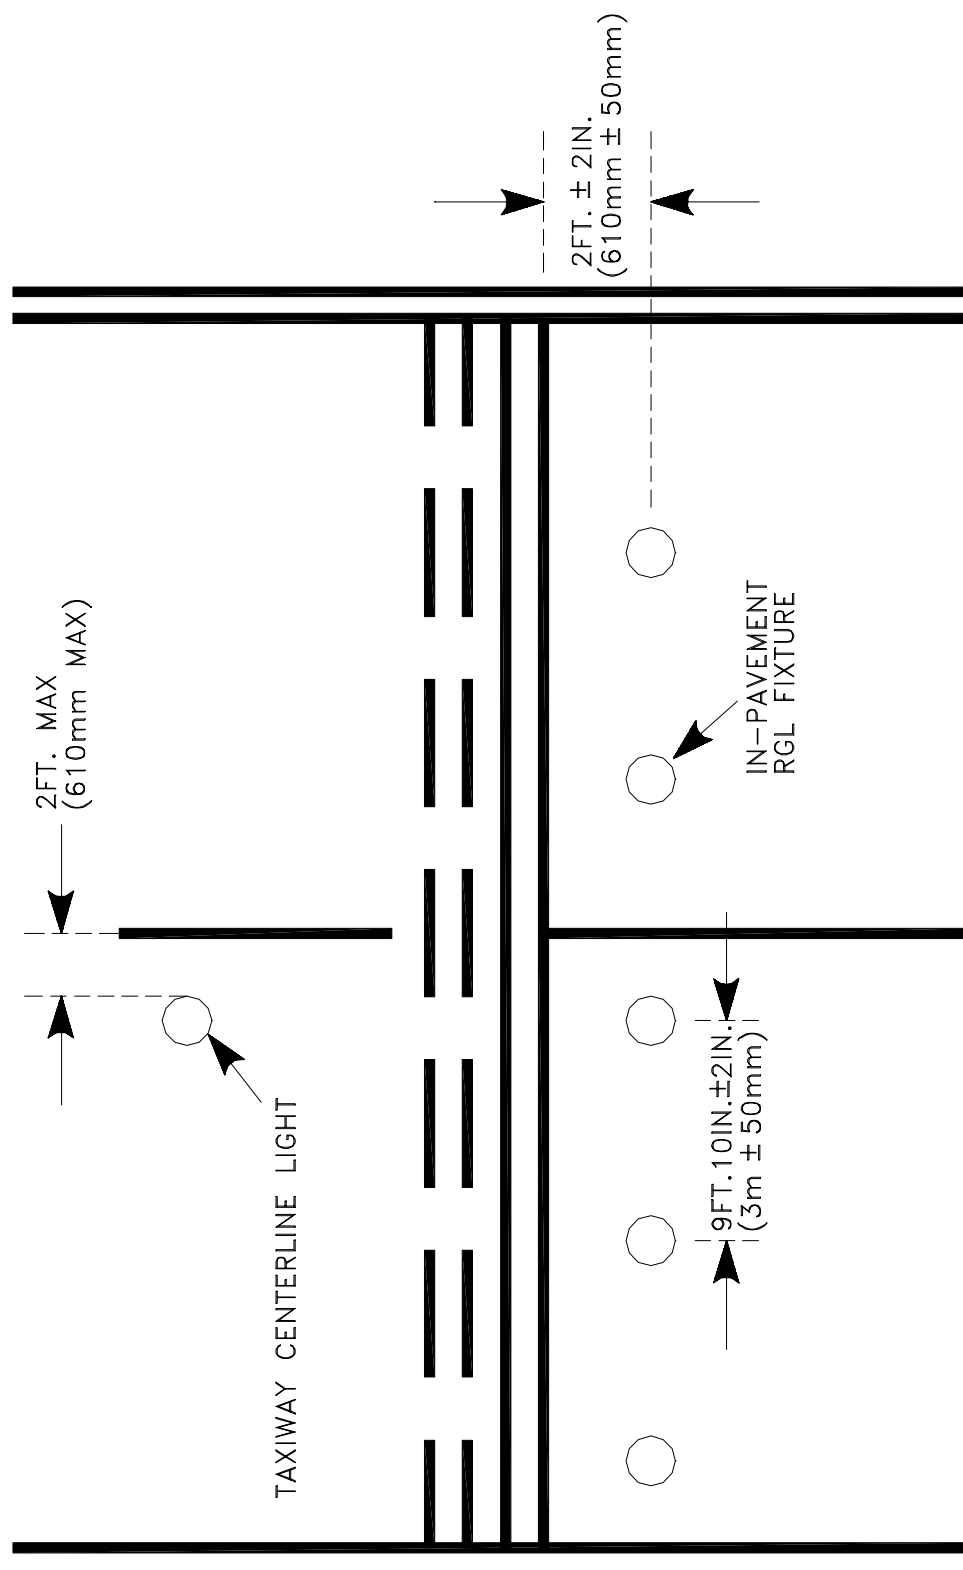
IN-PAVEMENT RUNWAY GUARD LIGHT CONFIGURATION
